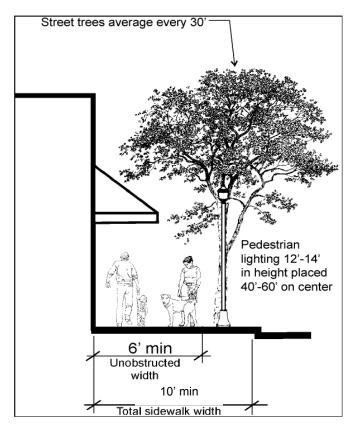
Sidewalk Requirements Secondary Pedestrian Corridors
